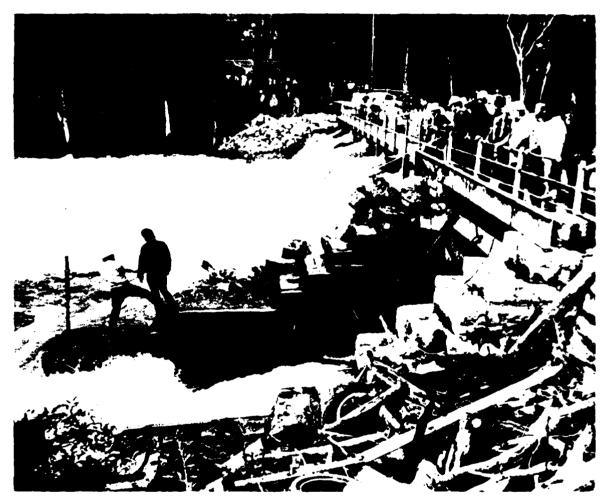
Workmen prepare to place large boulders in an attempt to reinforce a pier of the state dam at Owasco Lake outlet. Photo taken 25 June 1972.
